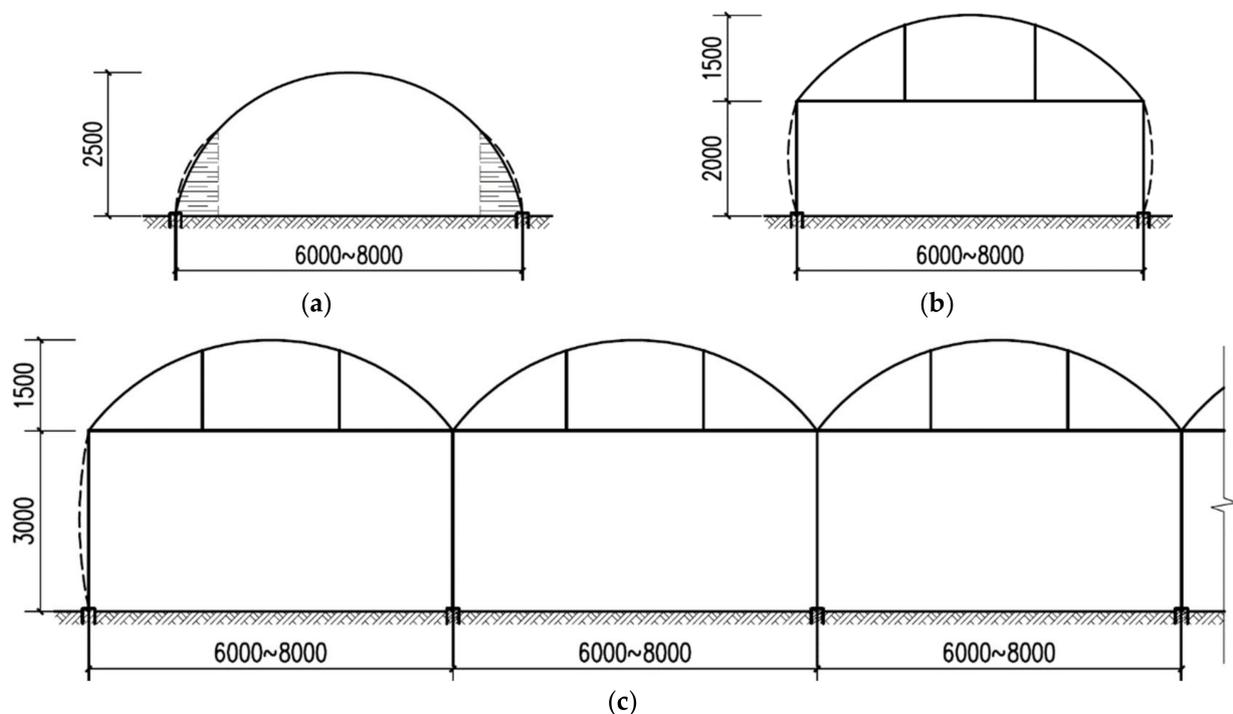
Evolution of the round-arch greenhouse structure (unit: mm). (a) Floor-type round-arch greenhouse structure; (b) Upright side wall type single arch greenhouse structure; (c) Multi-span round-arch greenhouse structure.
